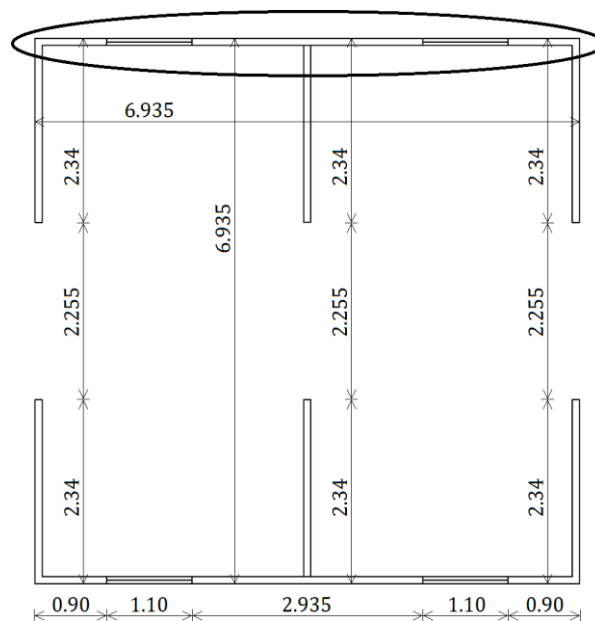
Plan of the ground floor of the case study building with the investigated wall highlighted.
